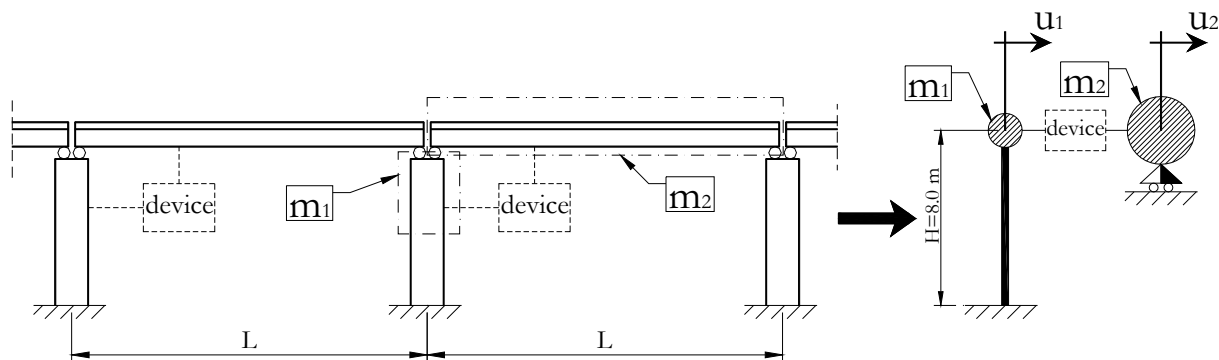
Reinforced concrete bridge (longitudinal view) and equivalent 2 DoFs model
